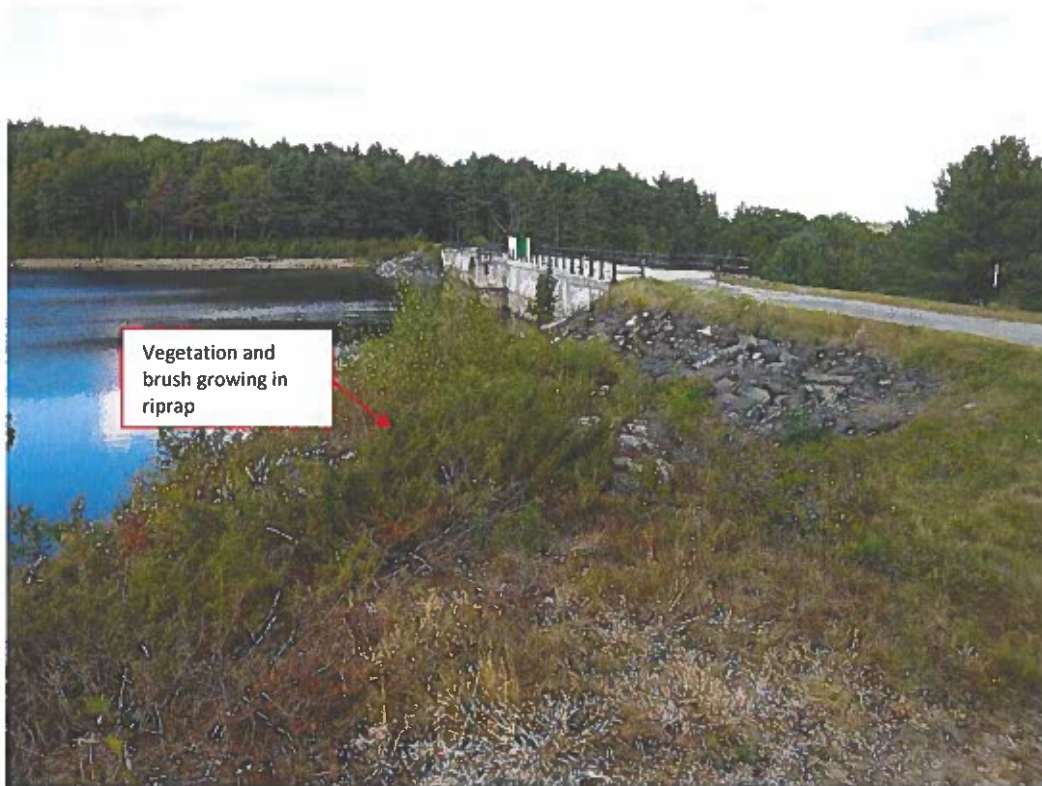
Overview of dam and upstream face from right abutment. Note vegetation and brush growing in upstream slope riprap.
